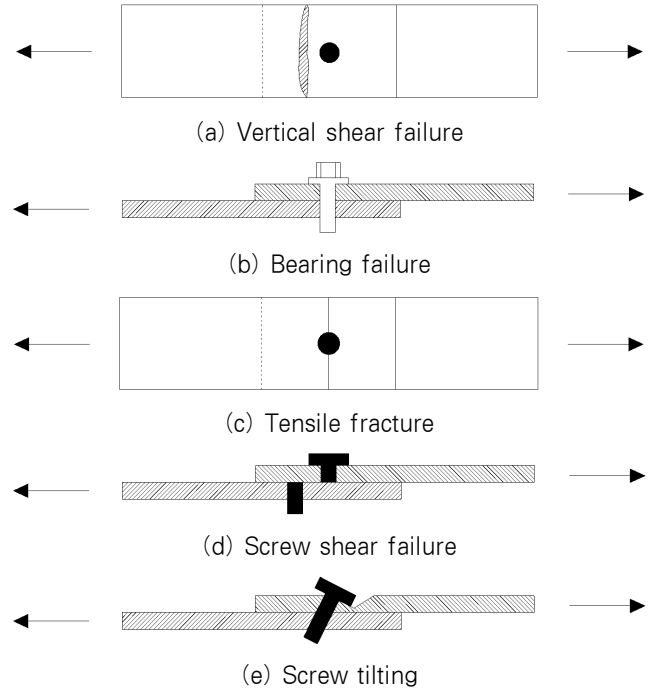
Failure behavior of light gage steel self-drilling screw connection
